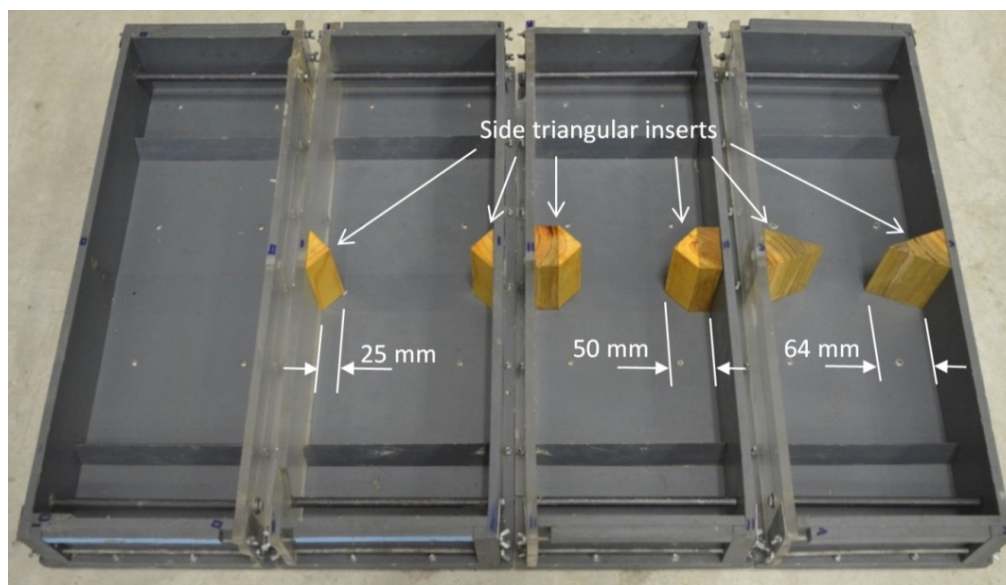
Layouts of modified shrinkage cracking moulds.
